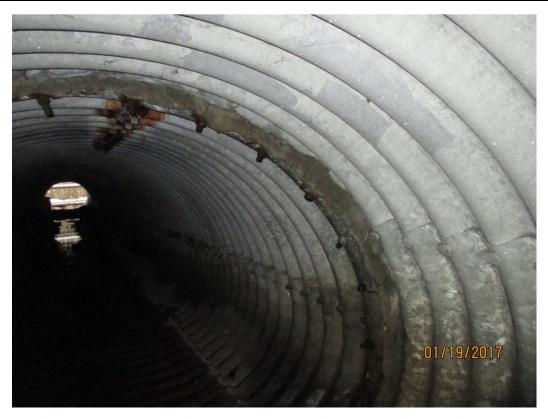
Connection between Section 2 and Section 3 of East Culvert Pipe
